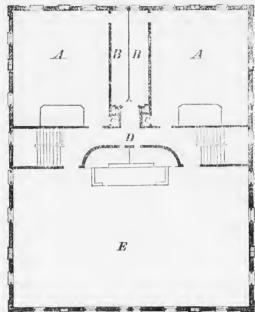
Plan of Second Floor of Design No. 55, Fig. 178.
